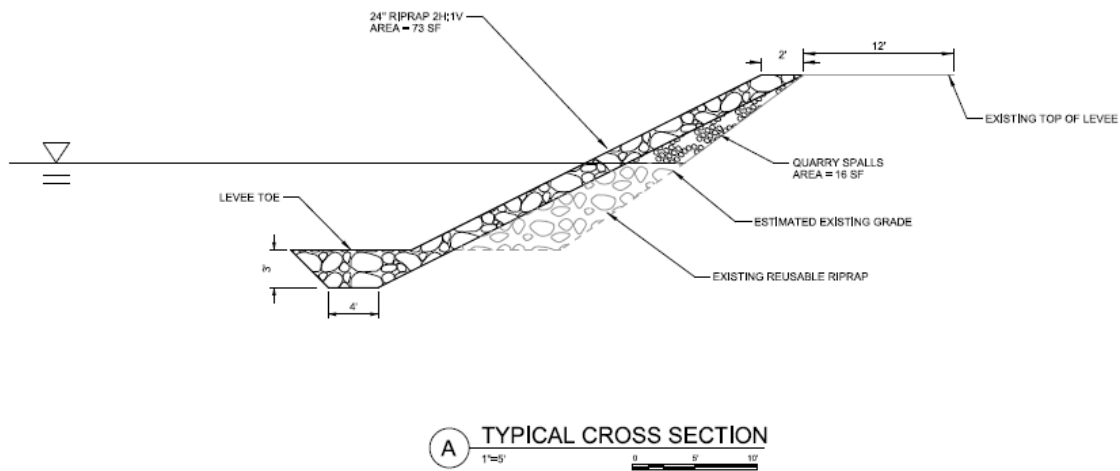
Typical Cross Section for Slope and Riprap Placement.
